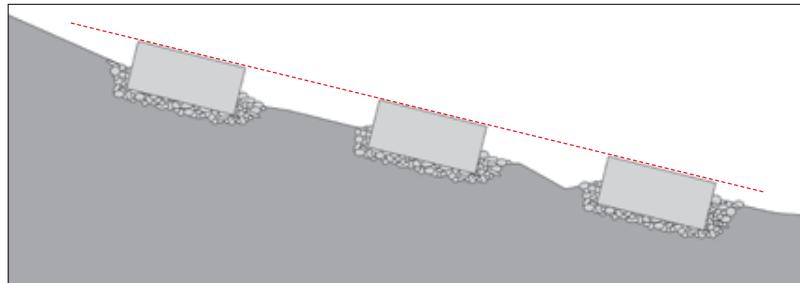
2 (flush alignment of the concrete foundations)
